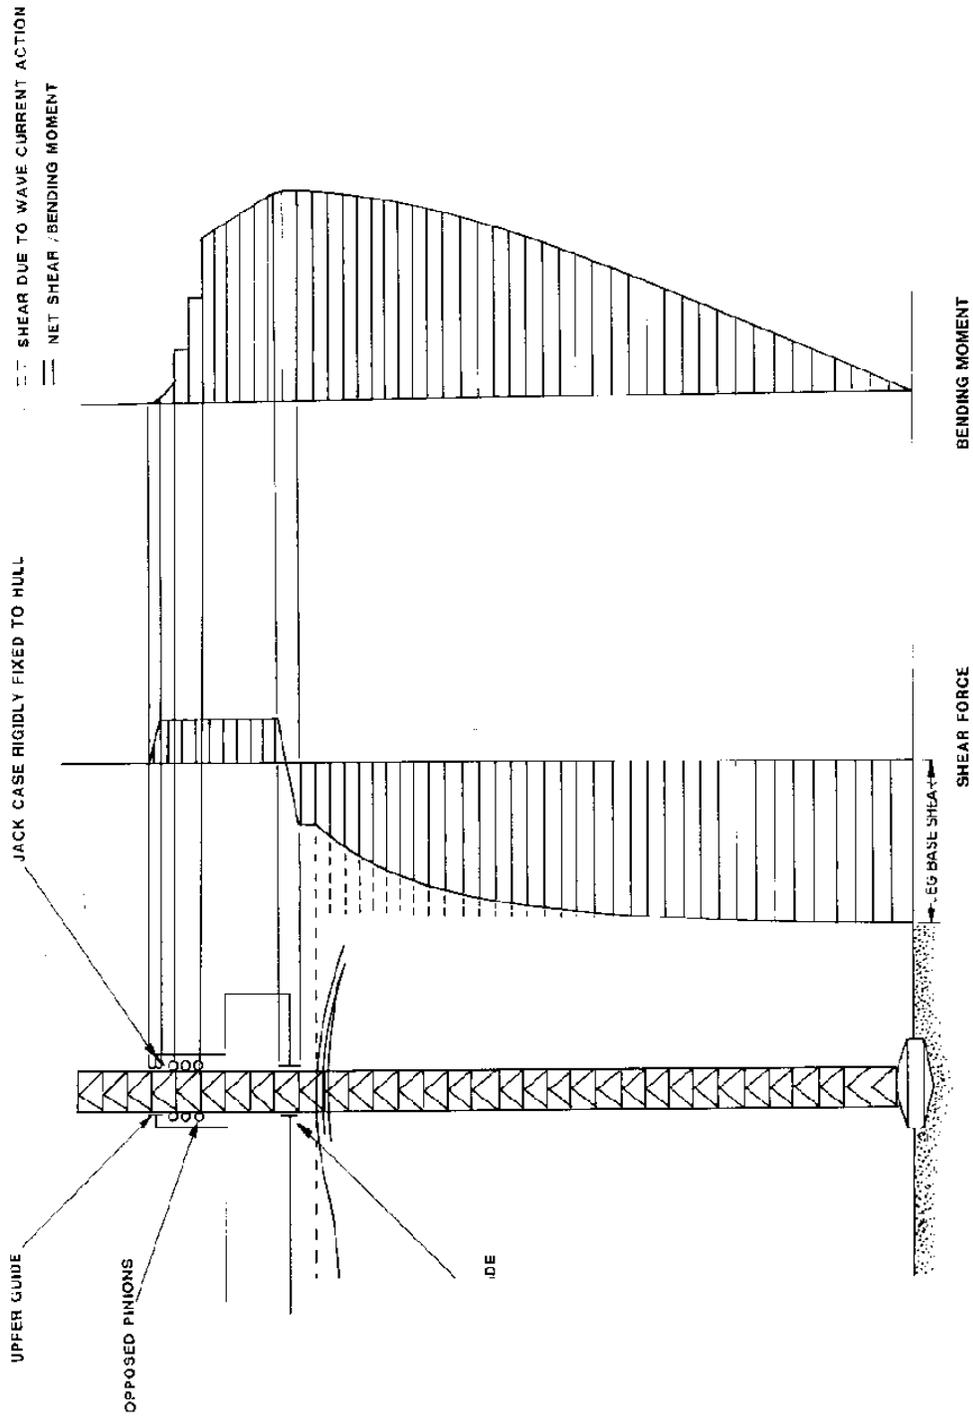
Leg shear force and bending moment - jack-ups without a fixation system and having a fixed jacking system with opposed pinions
